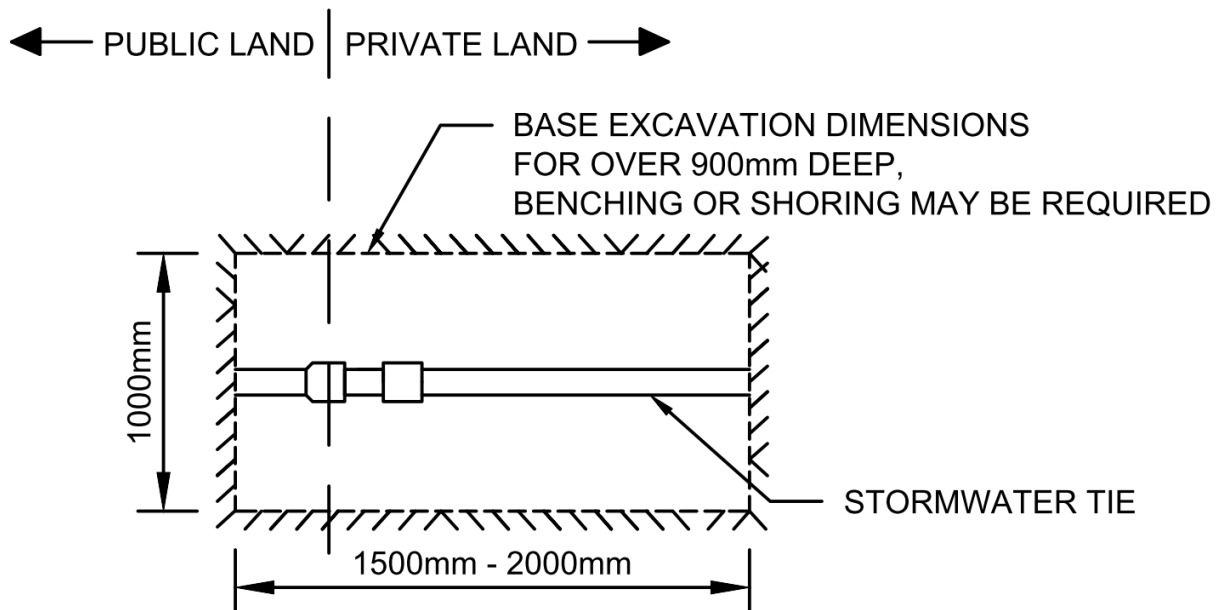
Plan View of Excavation Base Size for >1001mm Depth
